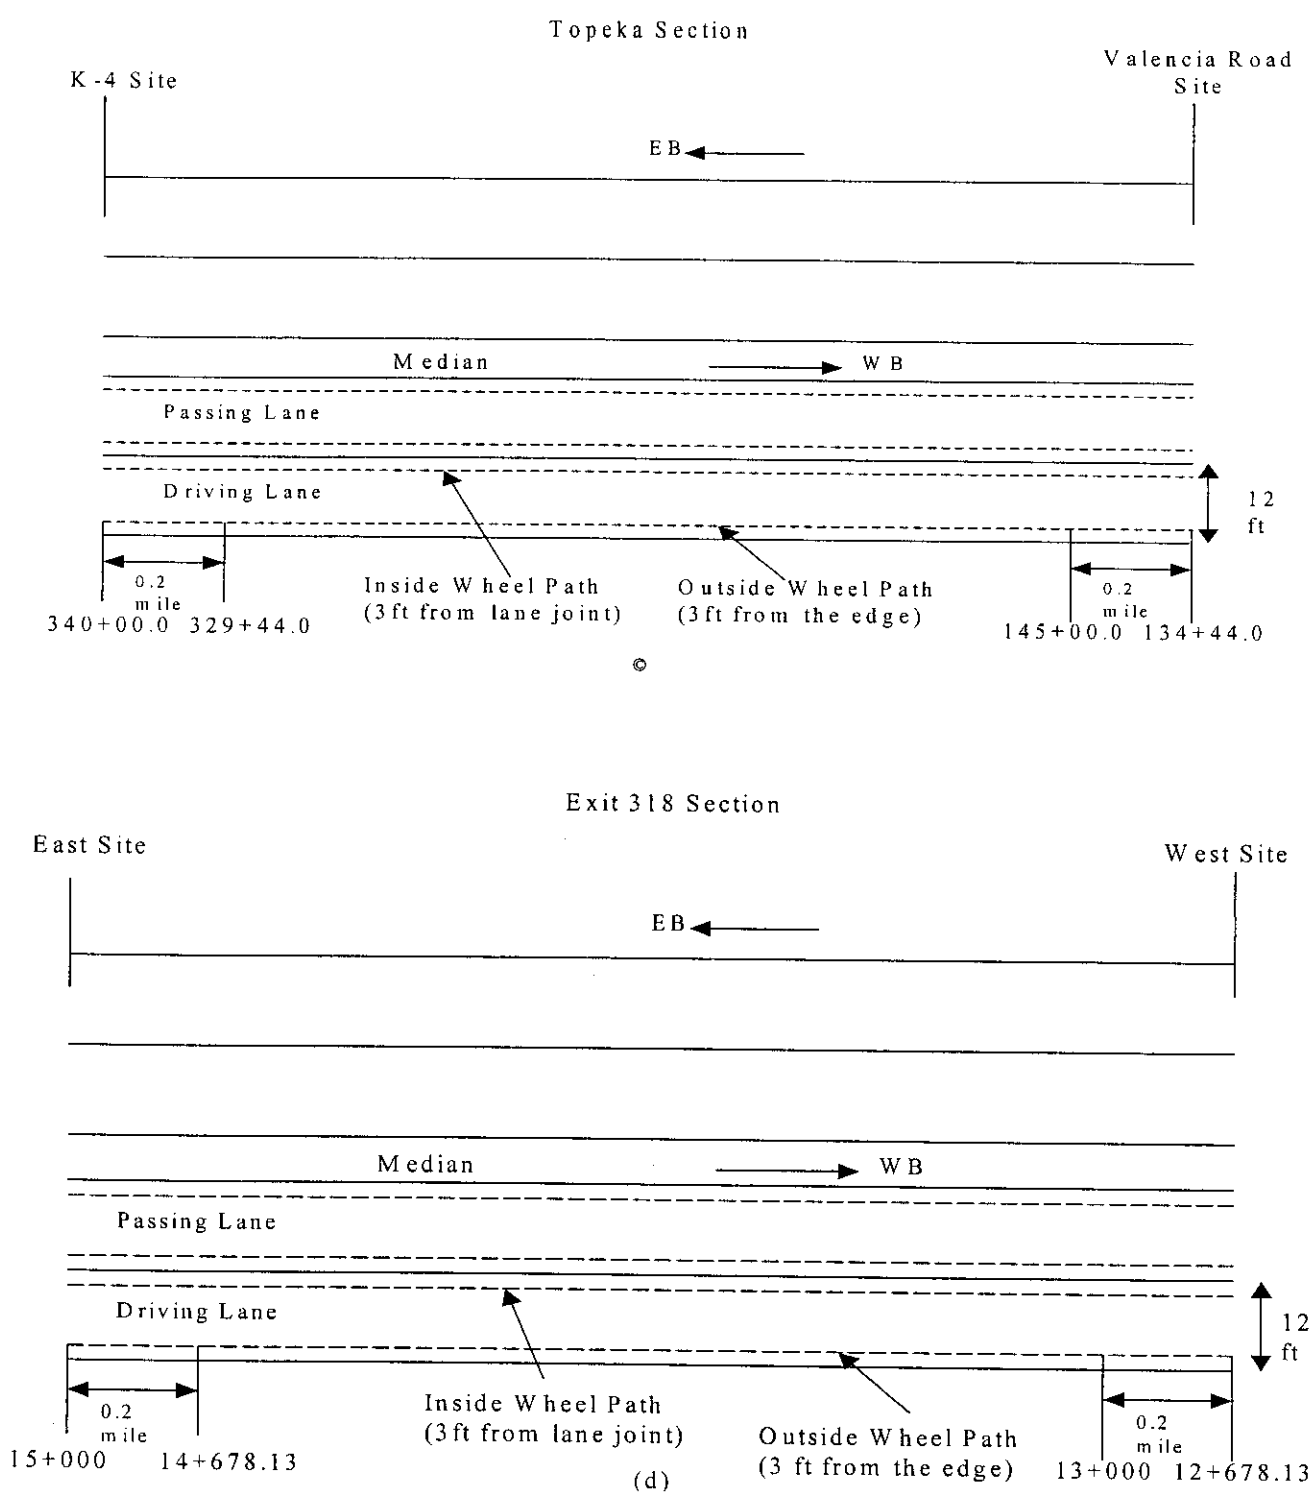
Layout of the Test Sections (c) I-70, Topeka Section, (d) I-70, Near Exit 318 (Contd..)
